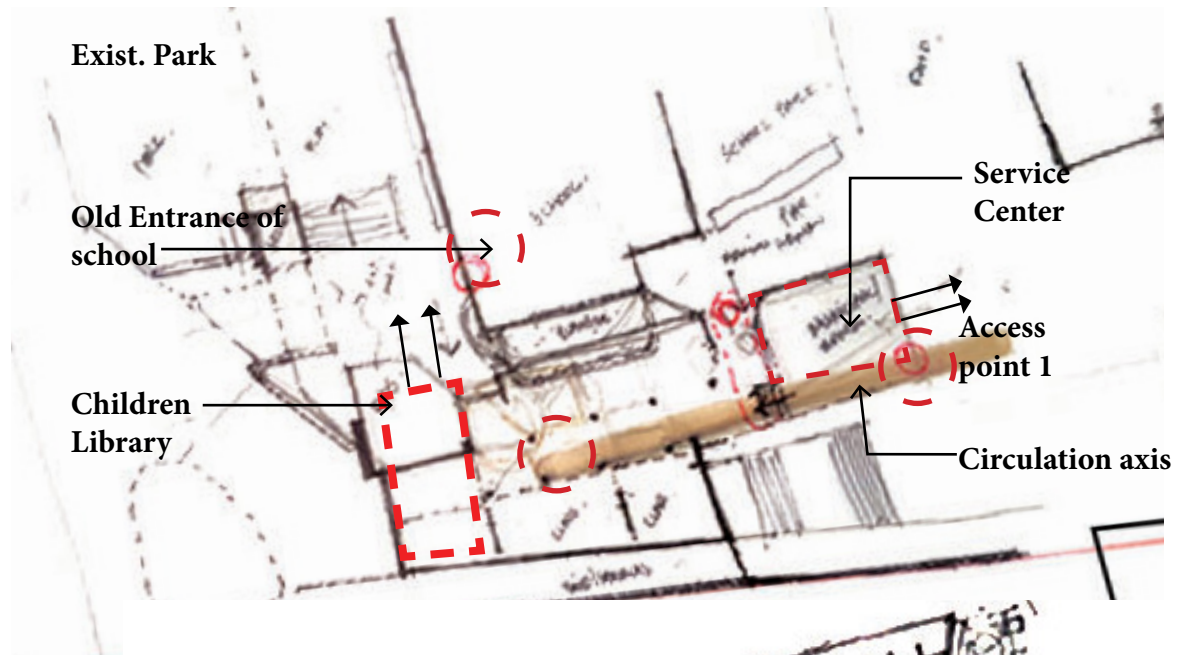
Design 2 - Level 0 floor plan development 1
